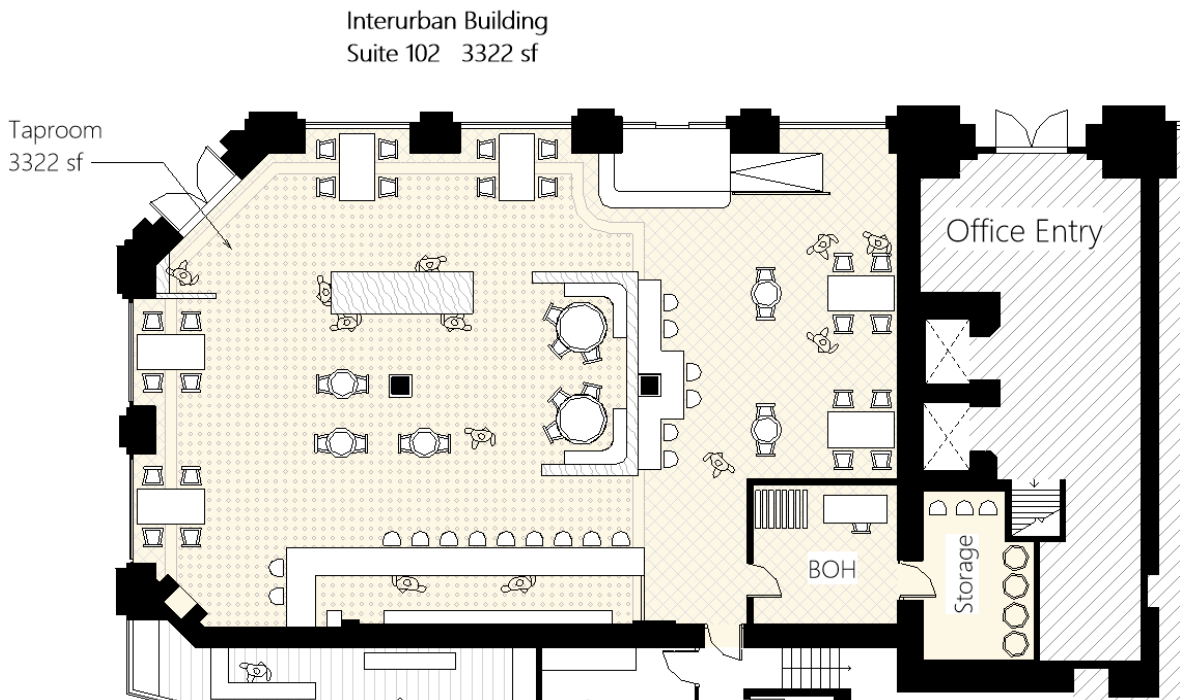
Floor plan of Interurban Building Suite 102. Refer to Appendix F for full plan.
